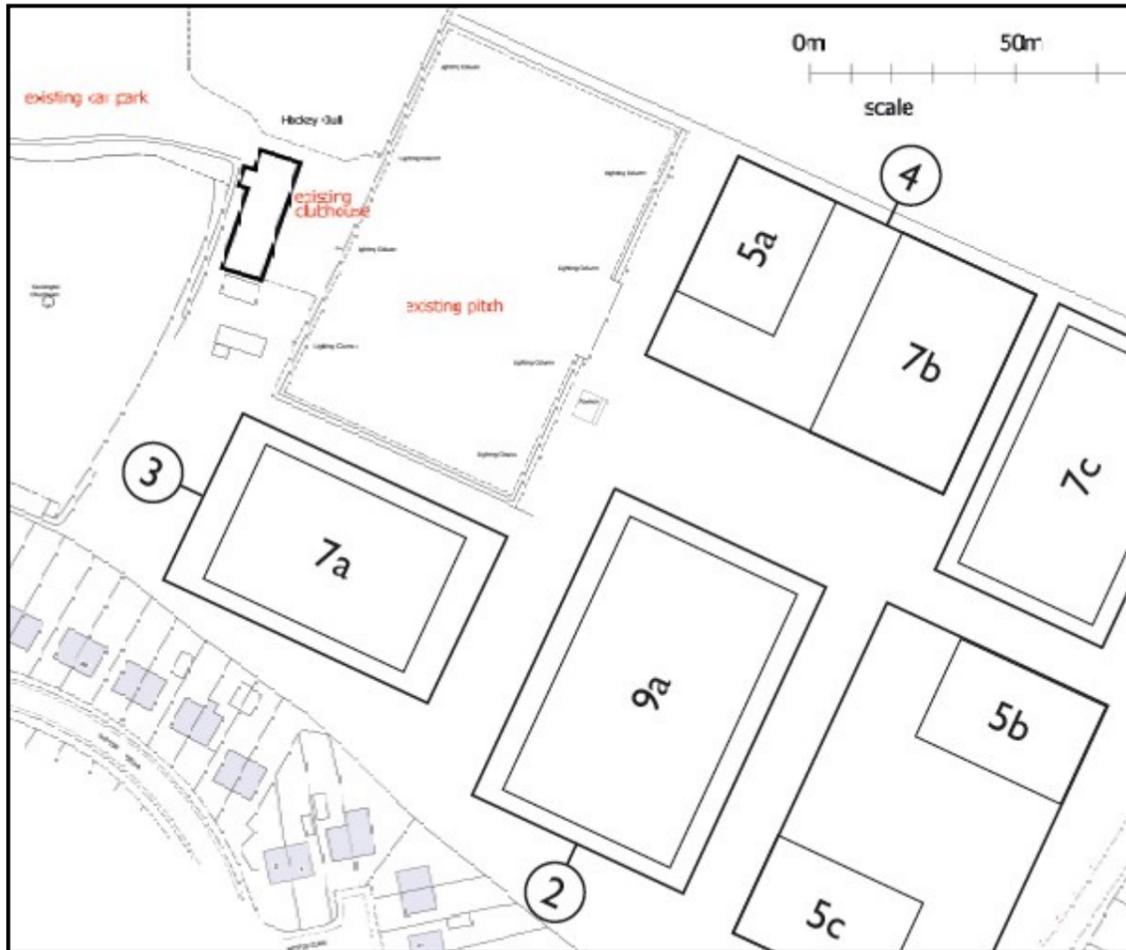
Existing wider Hockey Club Site Layout with pitches marked
